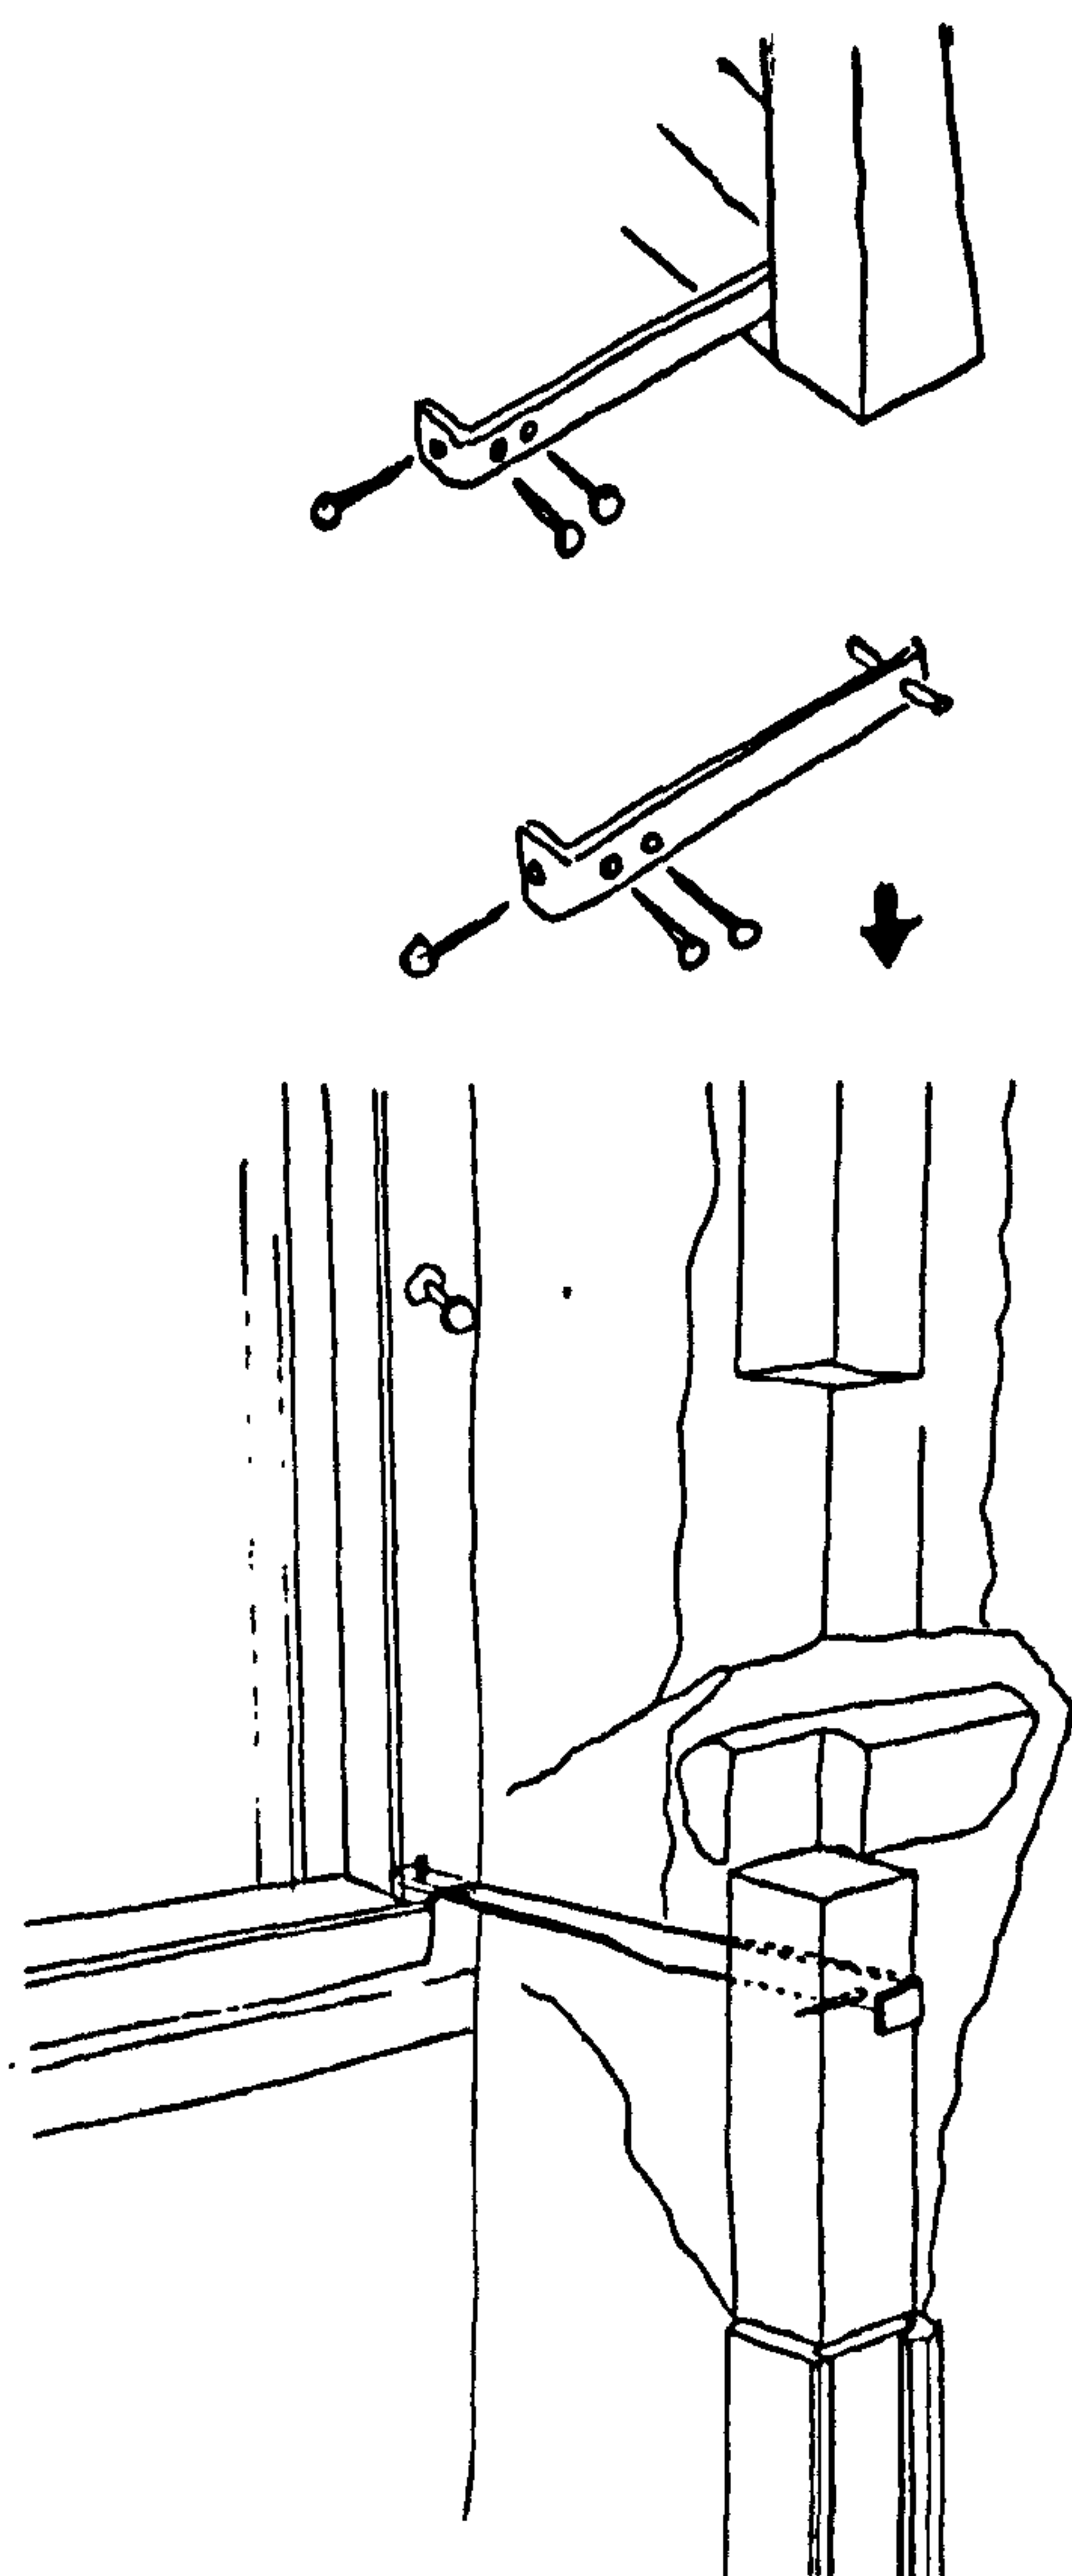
Fixing of stone window jambs to the *gaiola* (buildings I and P)
